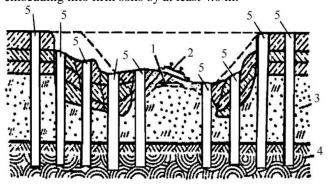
Diagram of earthwork stabilization in areas with soil protrusions in the recess: 1 – construction position of the road; 2 – road position after protrusion of main site soils and settling of recess slopes; 3 – a layer of weak soil; 4 – firm soil; 5 – columns of reinforced soil
